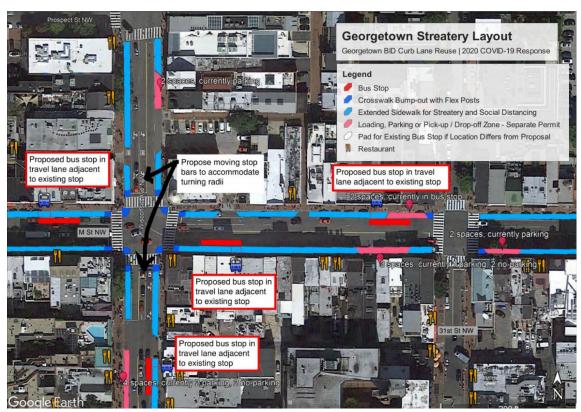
Proposed Streatery Design for Wisconsin Avenue and M Street, NW
